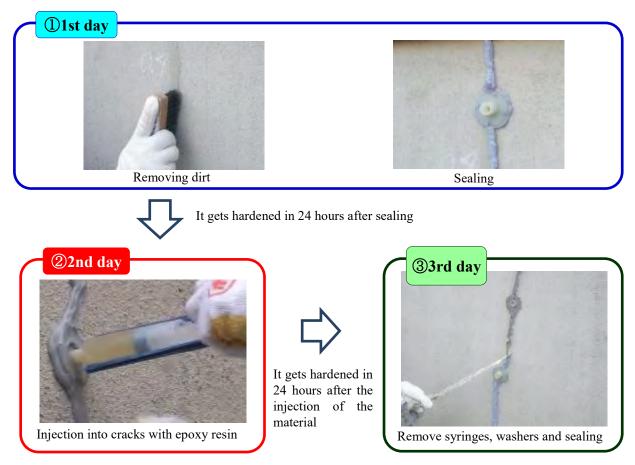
Outline of Crack Repair Method by Epoxy Resin
